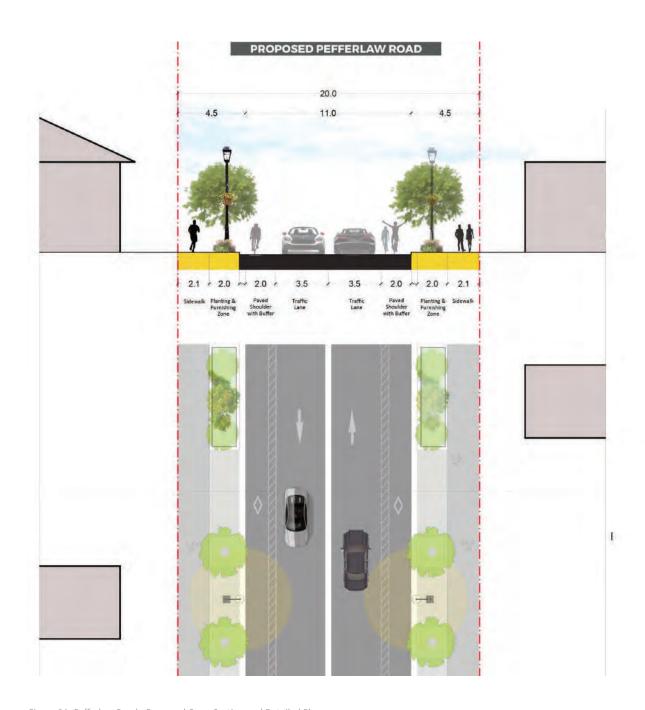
Pefferlaw Road - Proposed Cross Section and Detailed Plan
